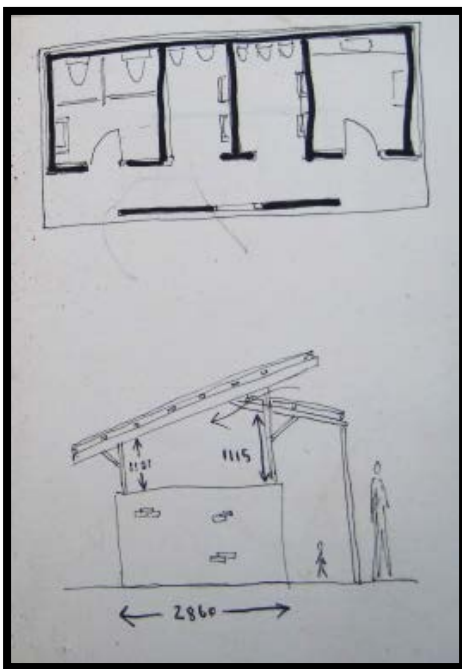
Plan and side elevation of the toilet block (Holley, 2011).
